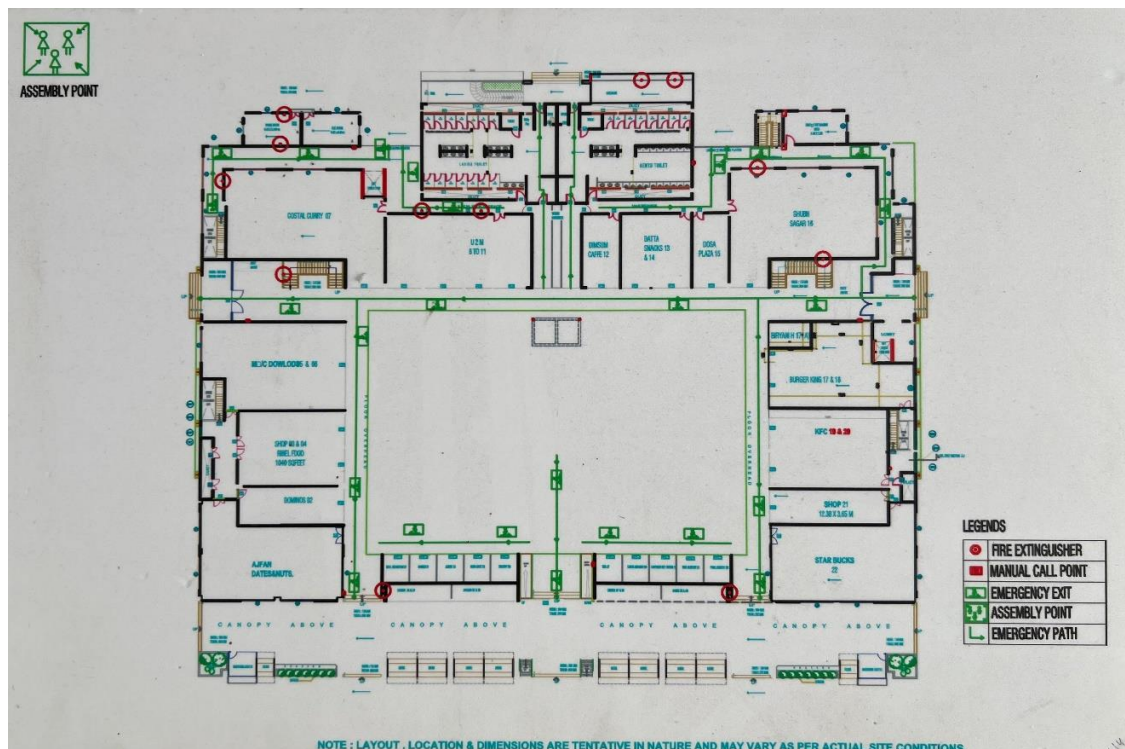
Site Plan and Surroundings of the Food Court.
